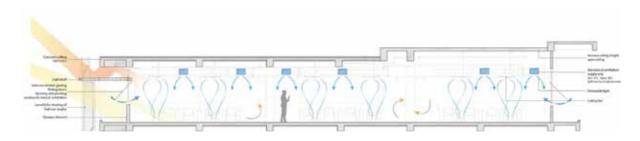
Typical section showcasing hybrid cooling concept elements such as the building facade working in conjunction with the MVAC system.
